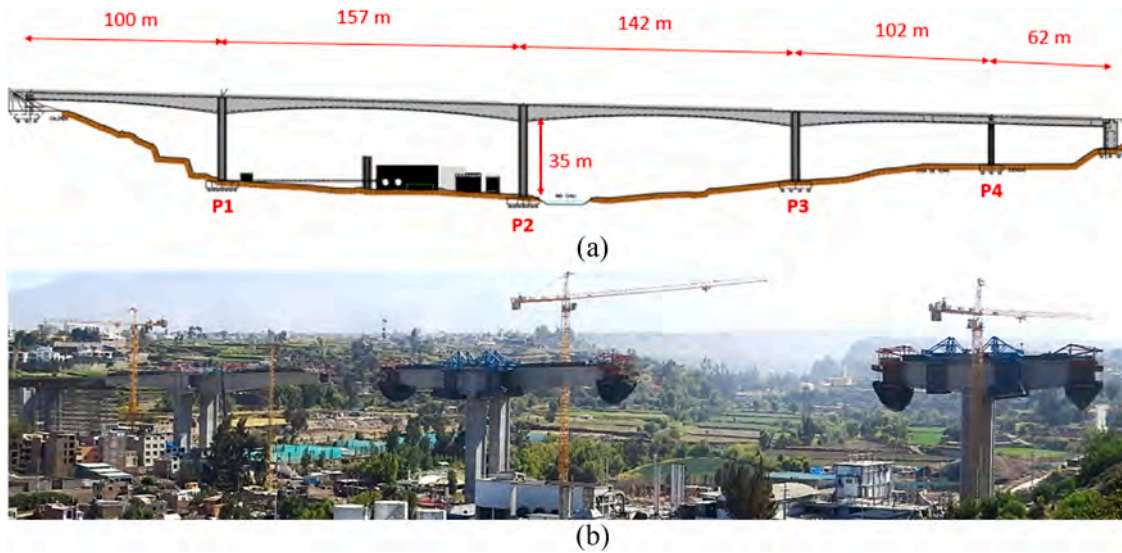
a: General Geometry of Chilina Bridge b: Photo of Chilina Bridge under construction.
